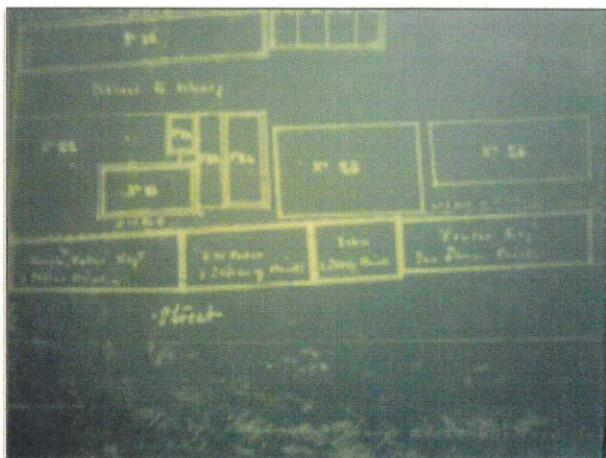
1849 plat showing detailed footprint of brick stores at location of 198 East Bay
